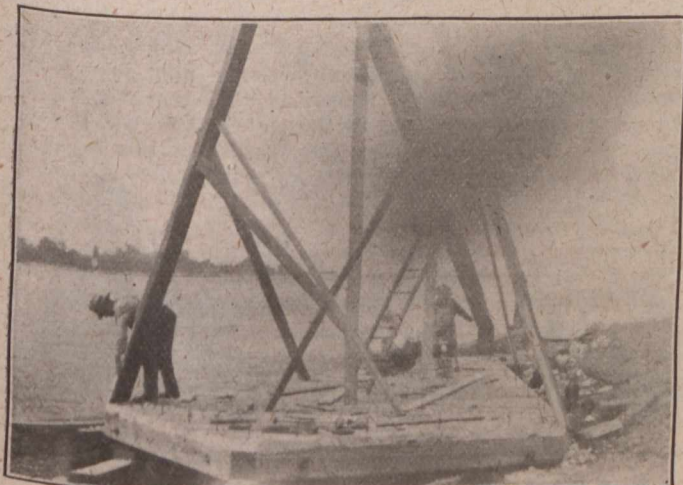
HEAVY TIMBER FOUNDATION FOR INTAKE STRUCTURE
